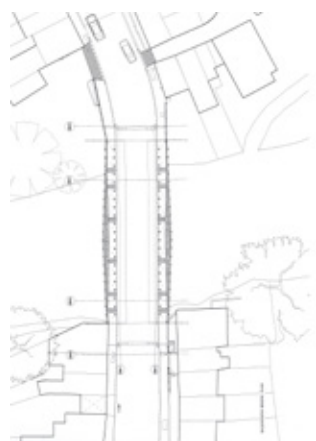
Plan of Ballingdon Bridge, the pavement formed of precast concrete and oak is enlarged at the centre of the bridge to place the priority of the design on the pedestrians who may stop to feed the ducks or simply enjoy the view
